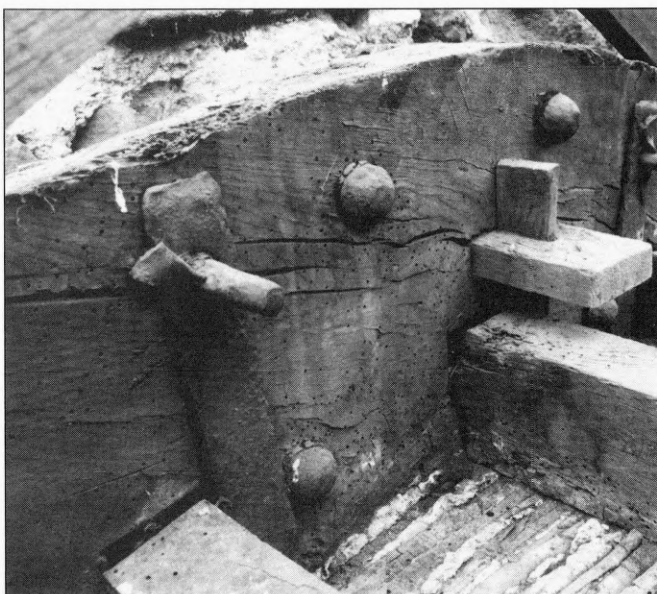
Chancel truss 3: detail of scarf joint fixings.
